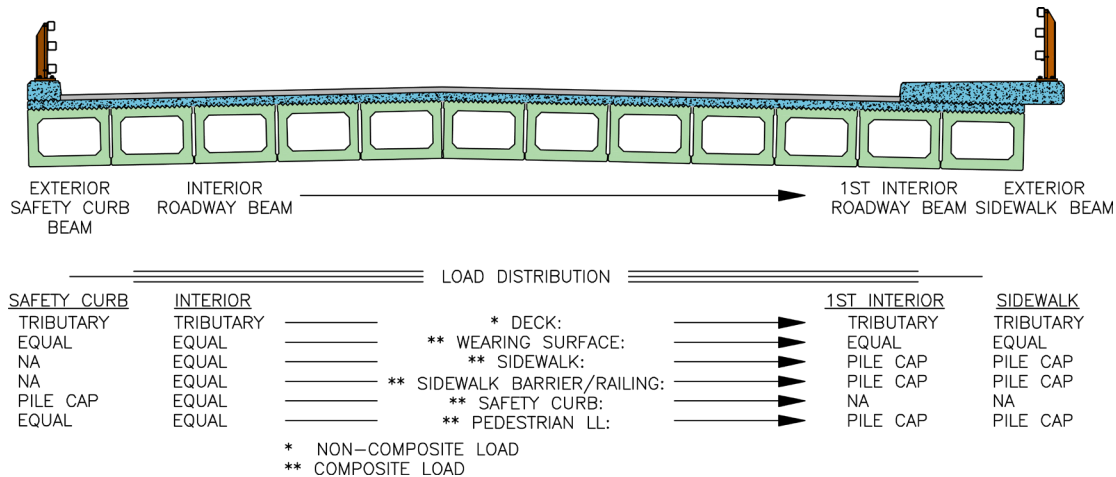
Adjacent Box/Deck Beam Terminology for Beam Identification
